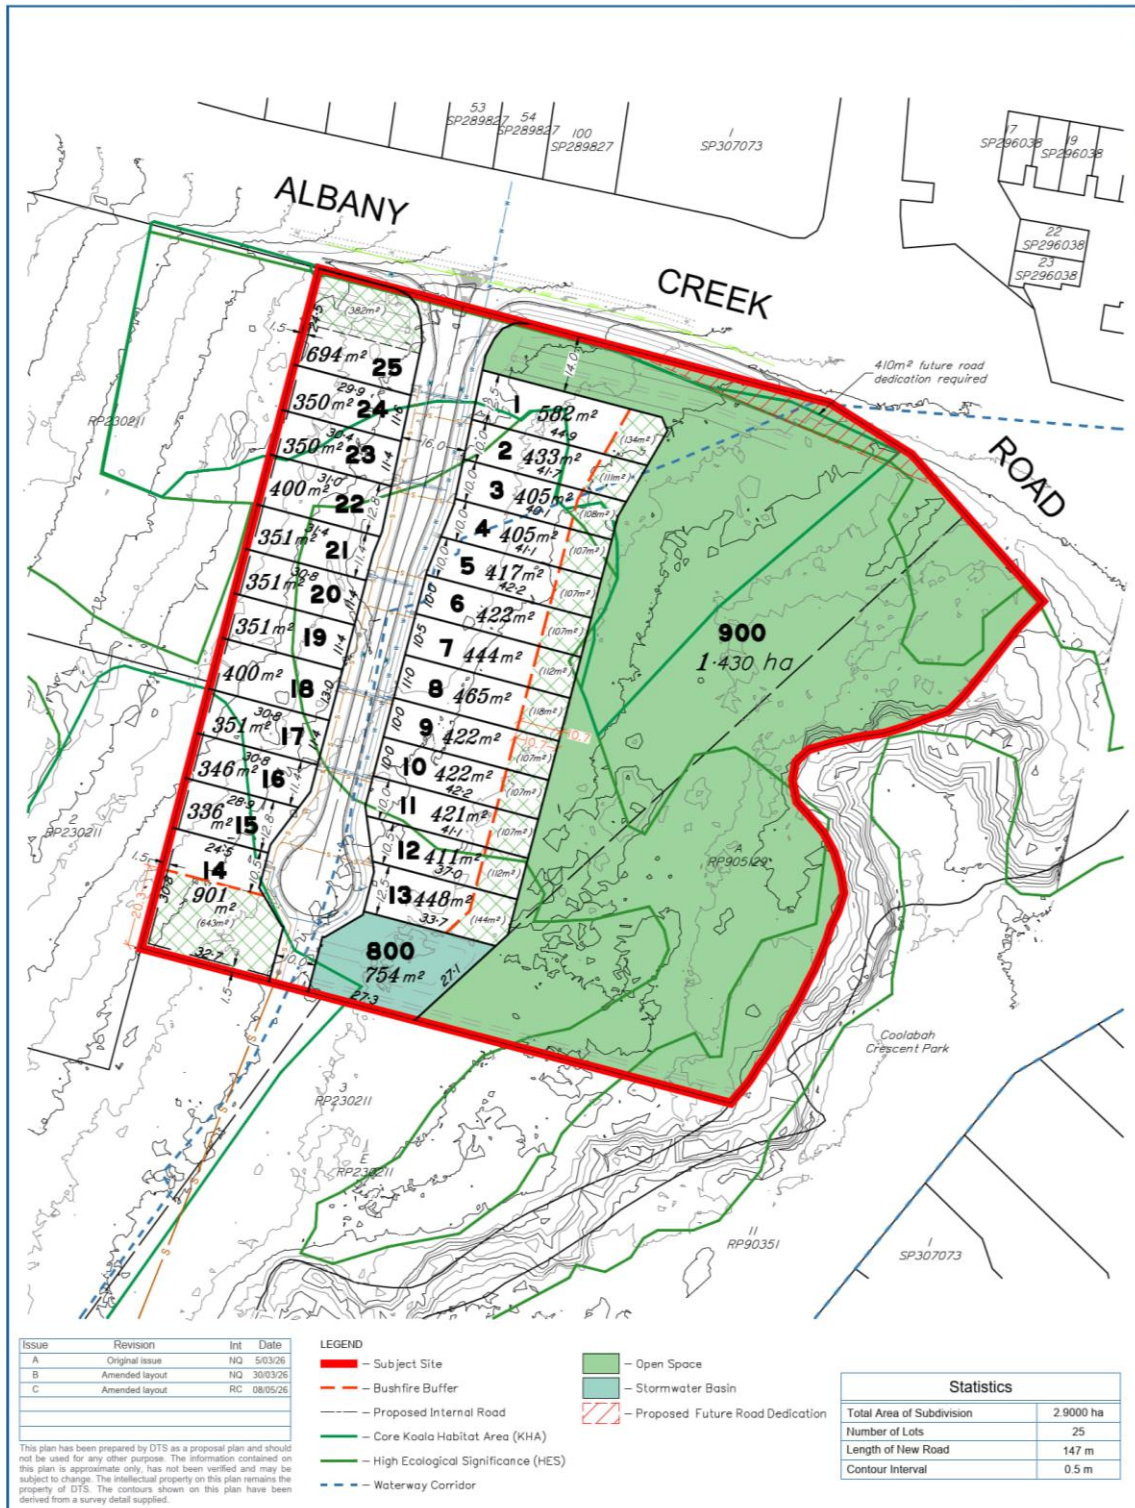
Proposed Plan of Development (Source: DTS 2026)
